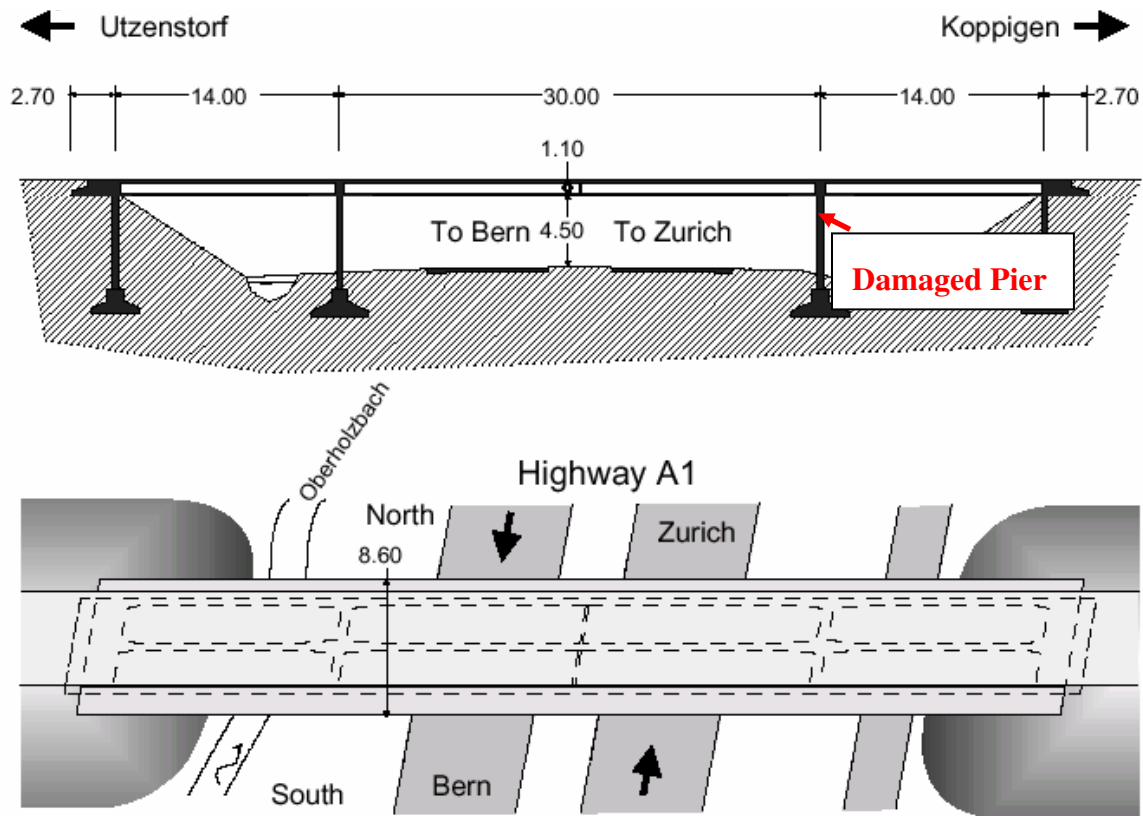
The geometry of the bridge; top and plan view (modified from the Z24 benchmark documents)
